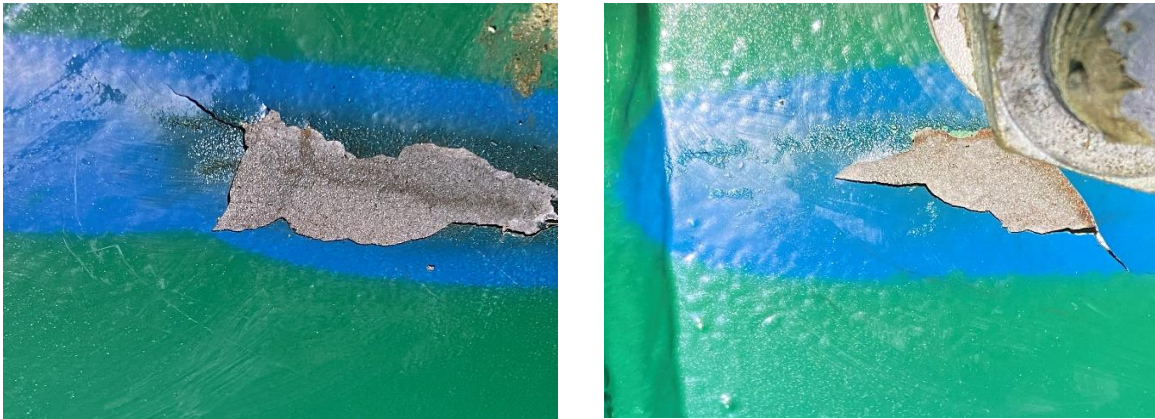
Close-Up of Plate Under Cracked Paint at Expansion Joint at Bent 19.
